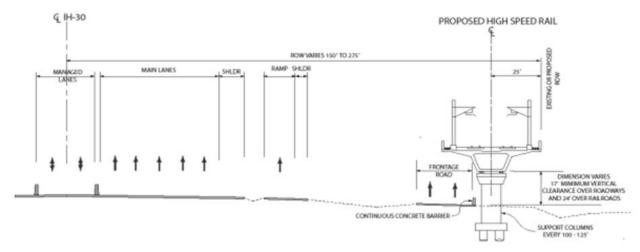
through 8 show conceptual typical section of a possible HSR facility. Figures 6 and 7 show HSR within the median or adjacent to IH 30. Figure 8 shows how the guideway could be adjacent to an existing railroad corridor. The potential HSR facility will have its own exclusive right-of-way adjacent to railroad right-of-way, but in the case of existing IH 30, it could share the existing right-of-way. Whenever the distance from the roadway to the support structure is insufficient for safety, it must be protected from the other modes of transportation with physical barriers as shown in Figures 6 and 7.
